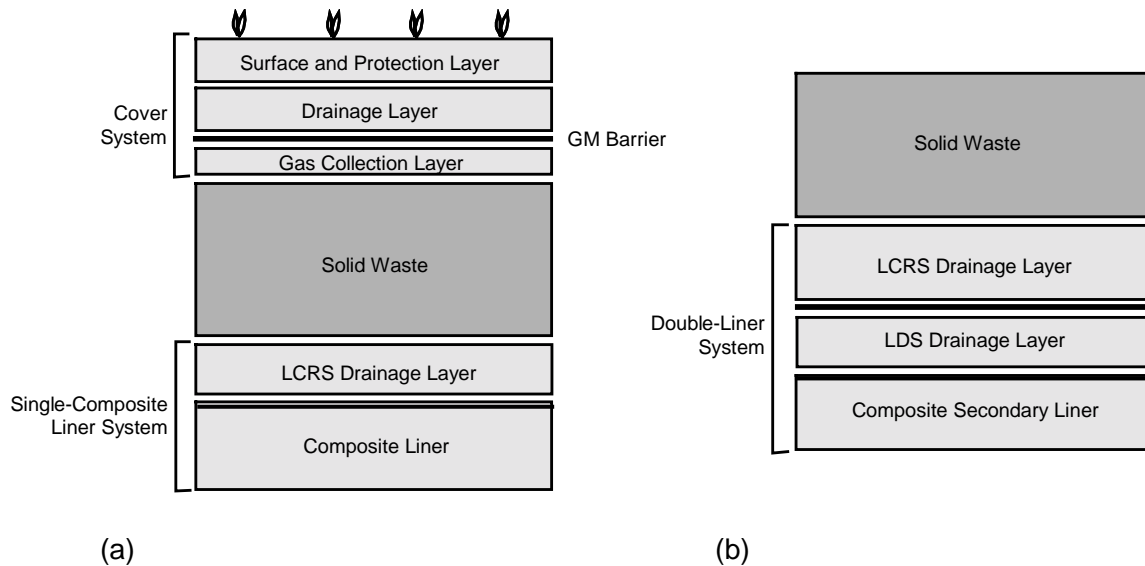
Typical waste containment system components for landfills: (a) single-composite liner system and cover system for a closed landfill; and (b) double-liner system for an active landfill.
